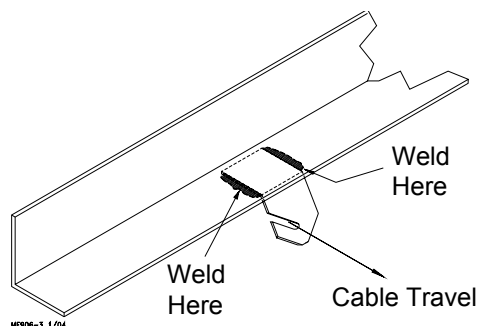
Welded Steel Truss Ceiling Bracket Installation
